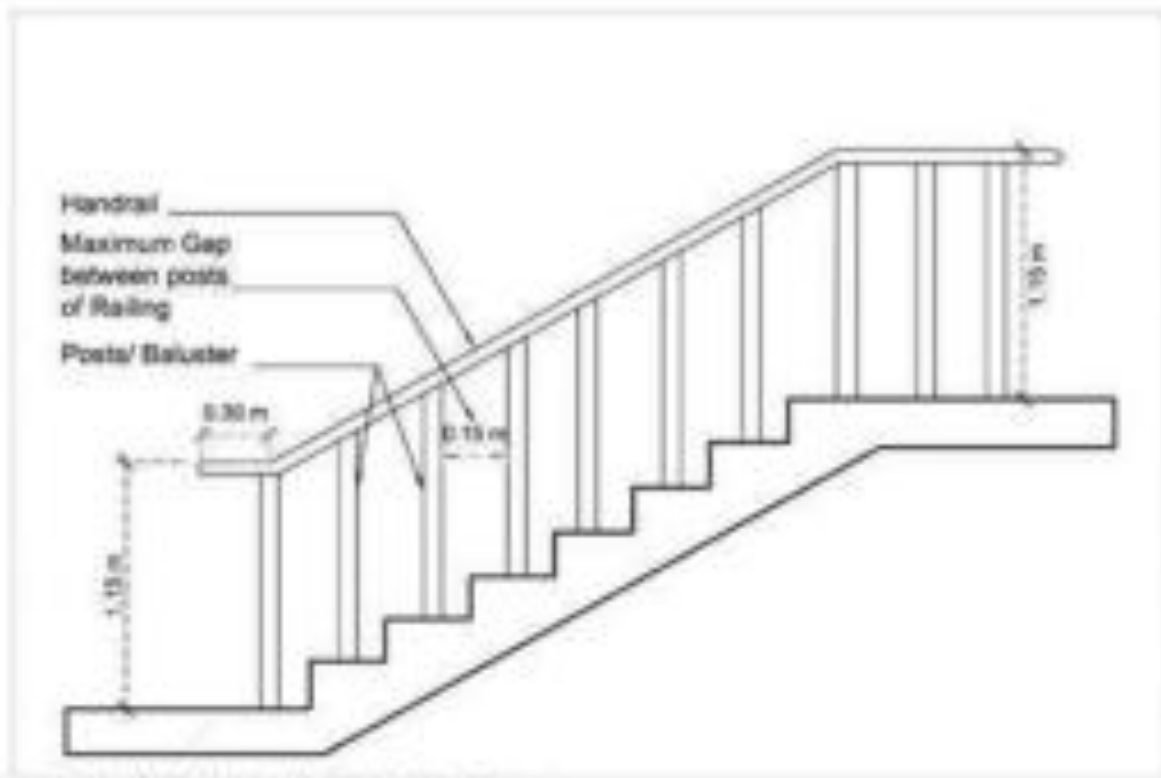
Fitting Detail of Railing/Parapet.
